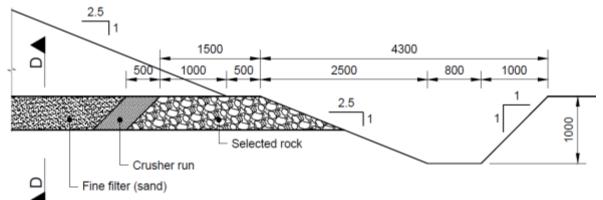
Typical Section of Toe Drain and Embankment Internal Filter
